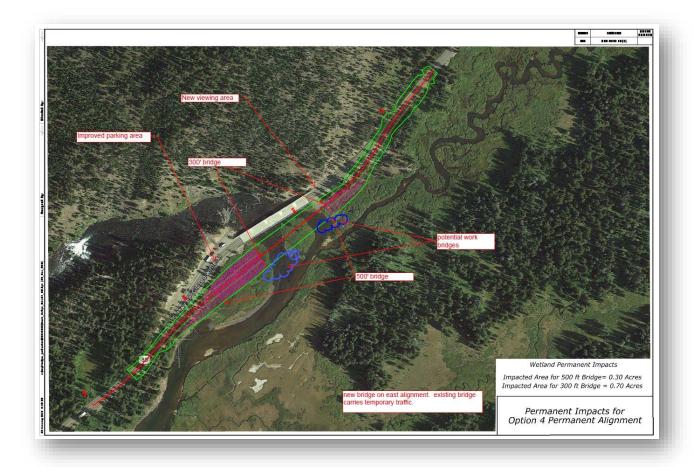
Replace bridge to east of current location, with work bridges east of new bridge.
